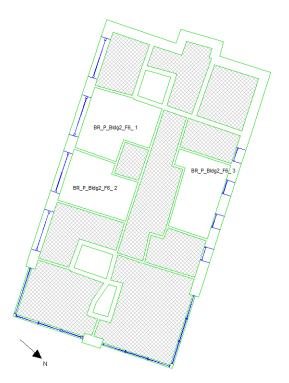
Level 6 bedrooms in Building 2 (larger plan in Appendix A)
